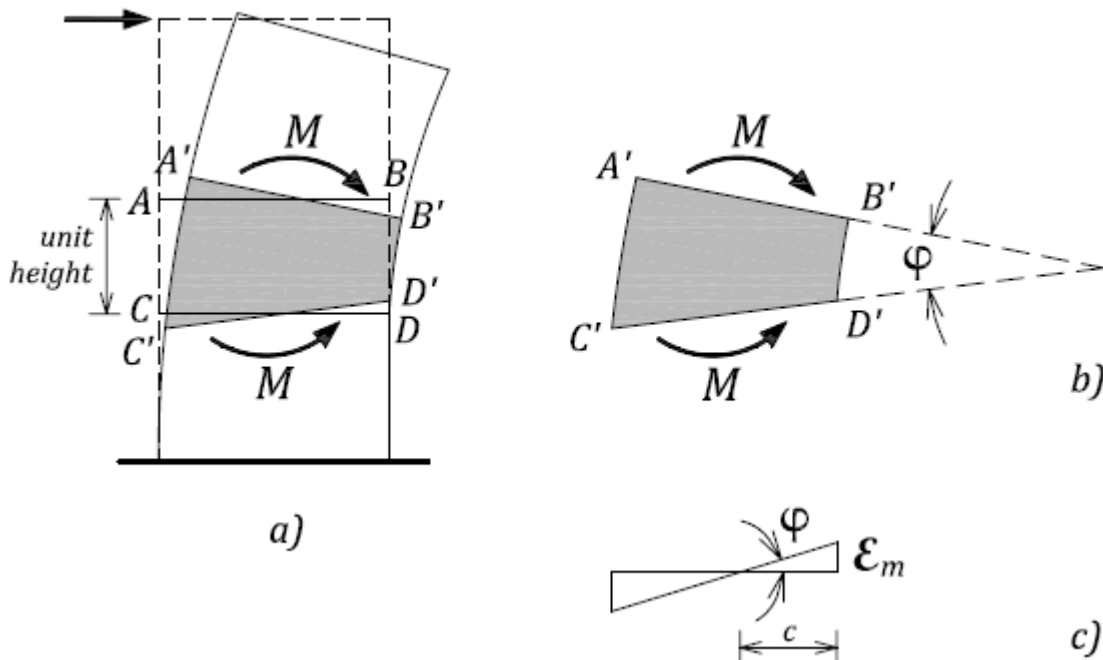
Curvature in a shear wall subjected to flexure: a) wall elevation; b) deformed wall segment ABCD; c) strain distribution along the section CD.
